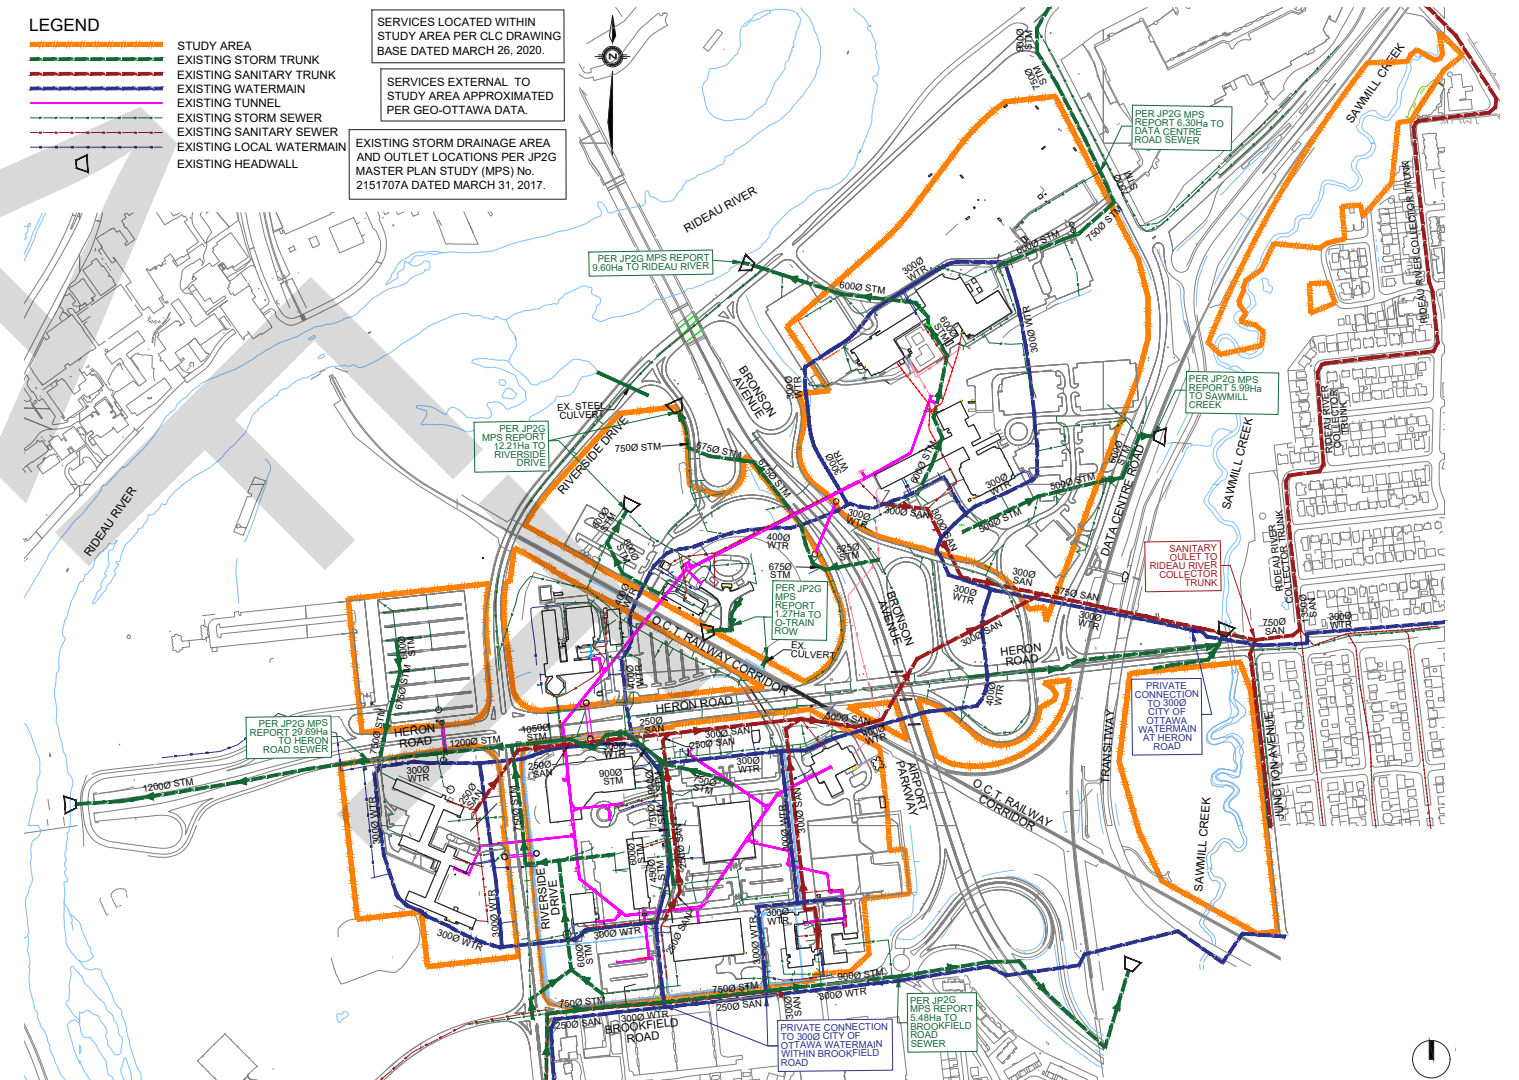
Existing Conditions Servicing Plan. Source: DSEL
